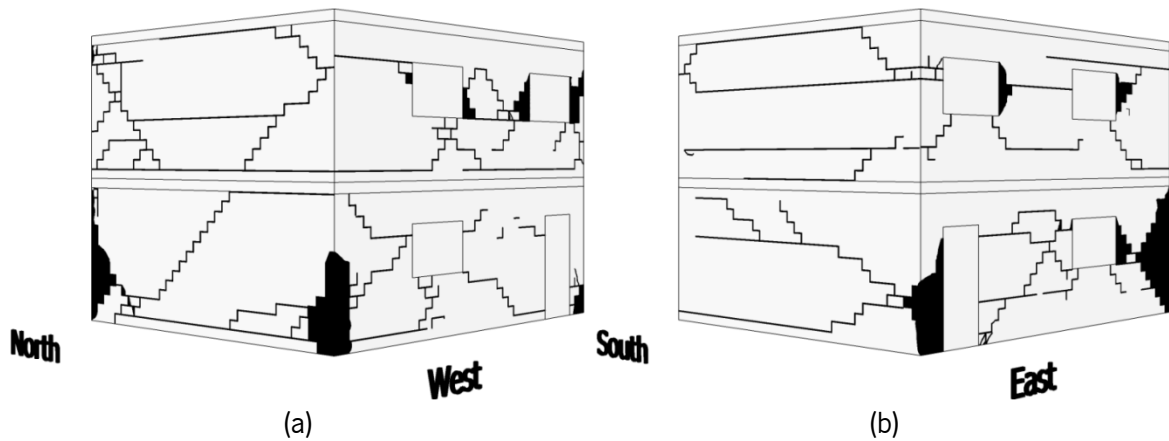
Final damage patterns in symmetric unreinforced masonry building: (a) north – west façades and (b) south – east façades.
